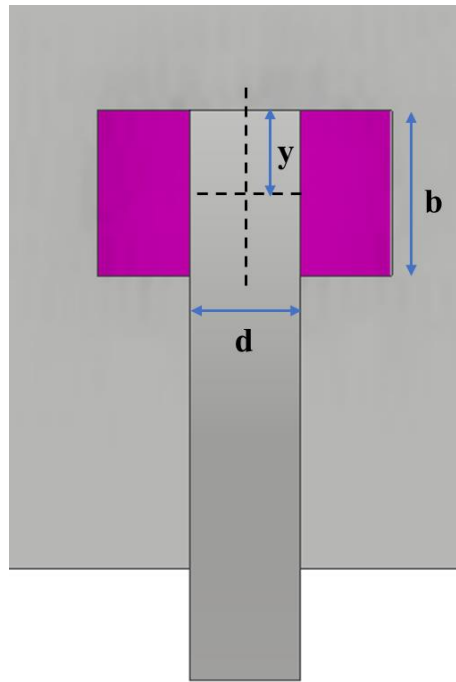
Dimensioning of the welds for horizontal component calculation.
